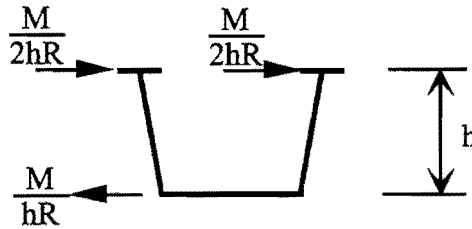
Lateral Load Components on Quasi-Closed Box Girder Due to Curvature
